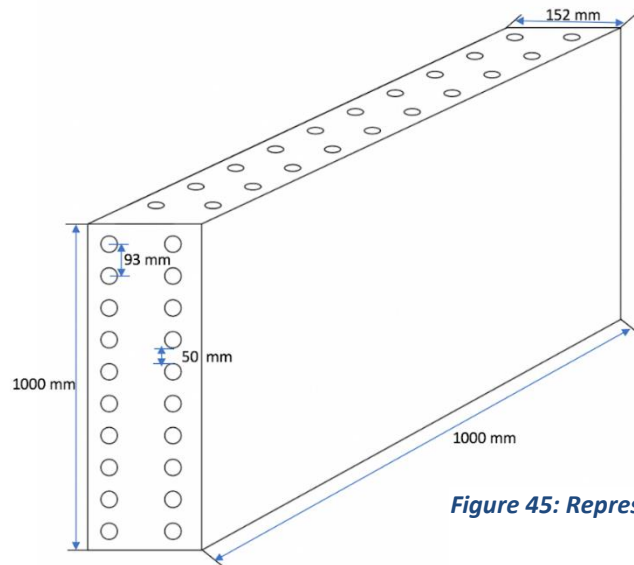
Representation of Ramp Shear Wall With Reinforcement
